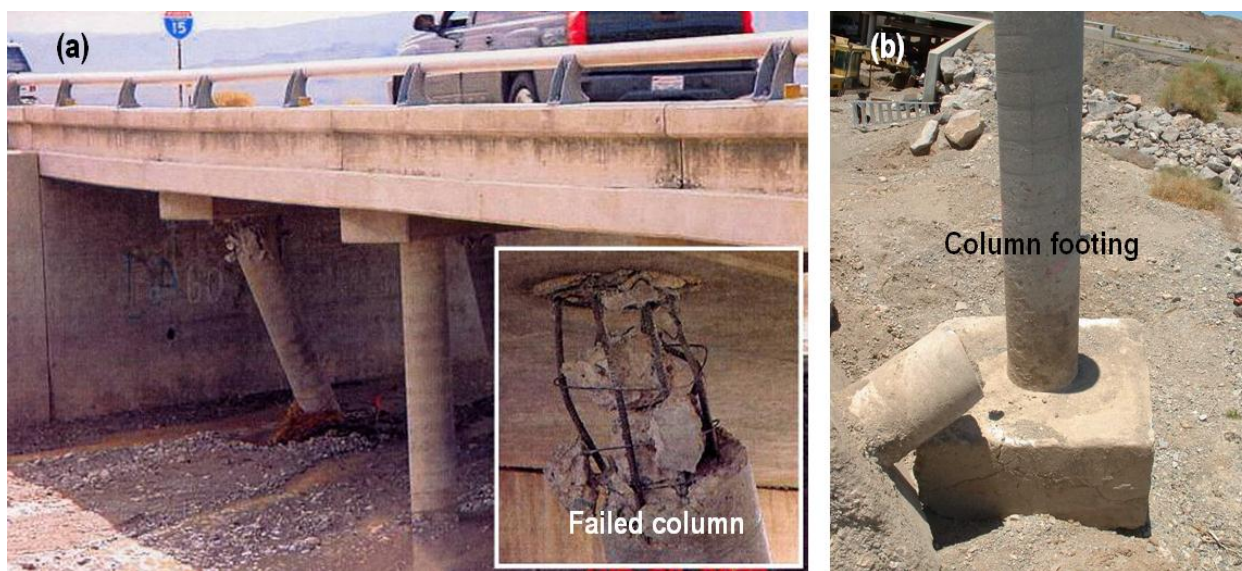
Oat Ditch Bridge on I-15 in California (a) failed column (b) column footing
